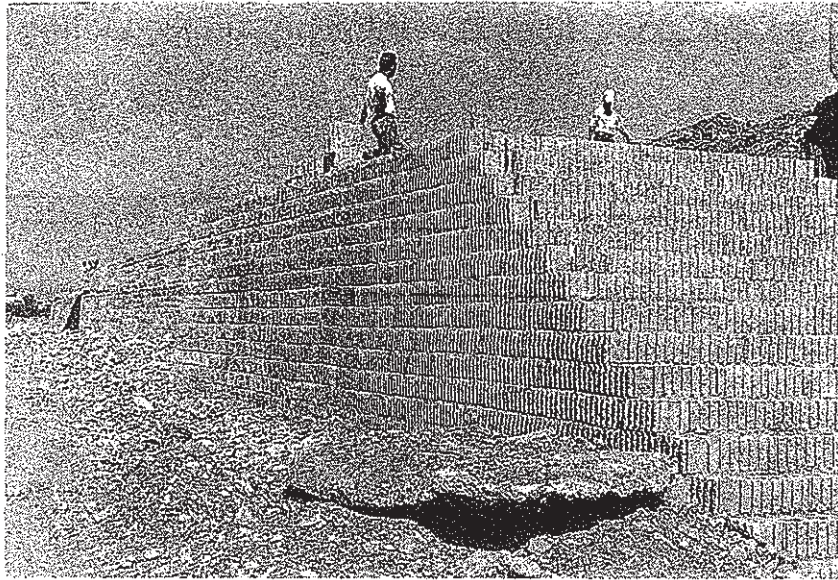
Steps of the Manavgat Geosynthetic Reinforced Segmental Retaining Structure
